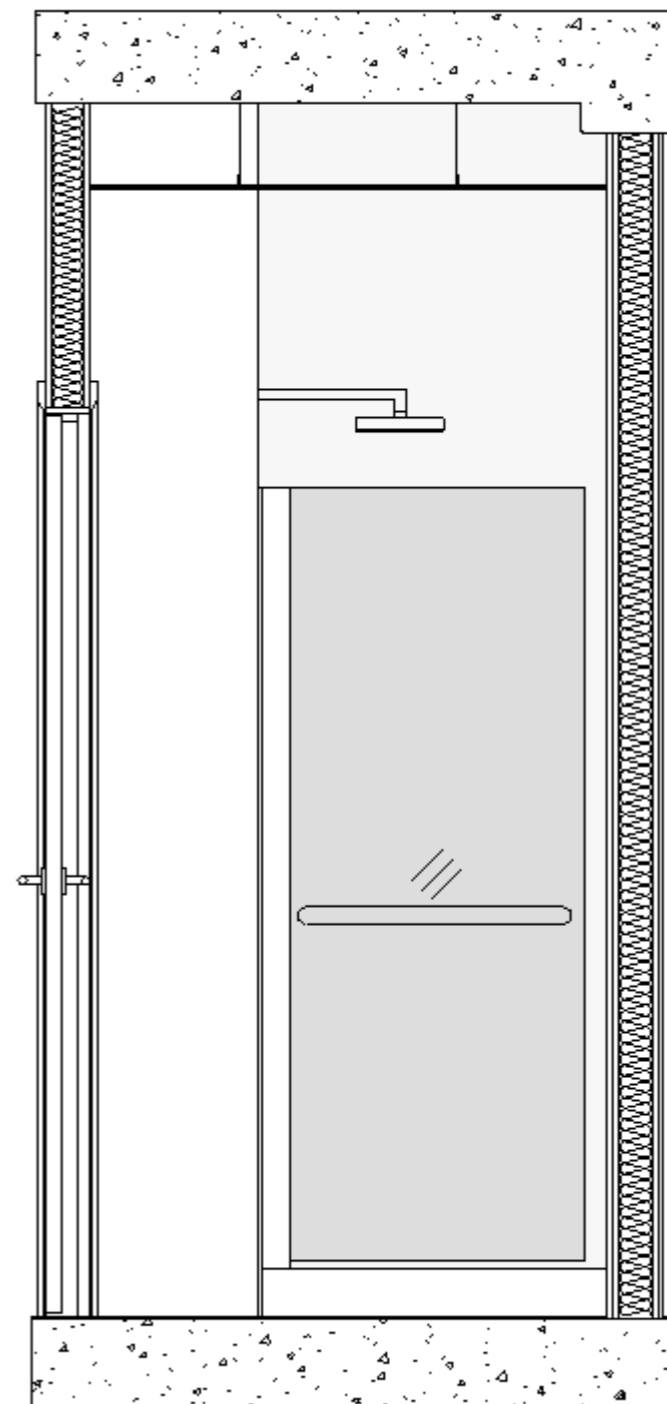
Enlarged Student Bathroom Section (Author, 2021)
